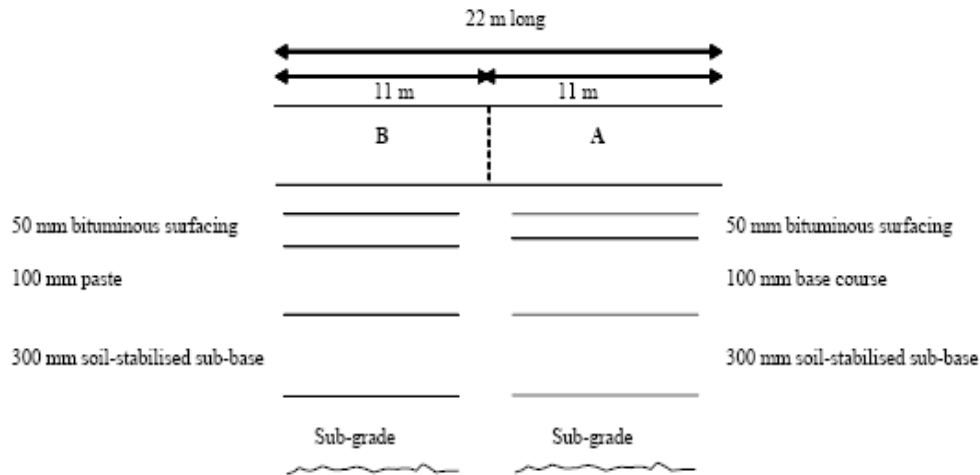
Layout of the trial construction layers at the King's Mill Hospital site.
